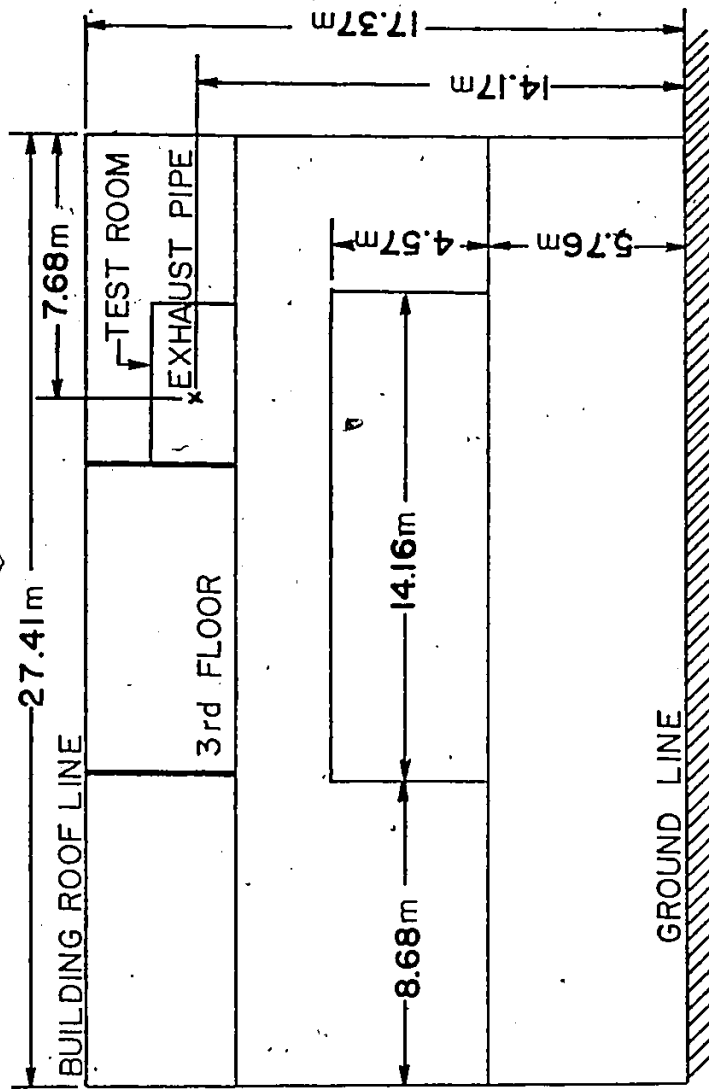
LOCATION OF ENGINE LABORATORY, WEST ELEVATION VIEW OF BUILDING
